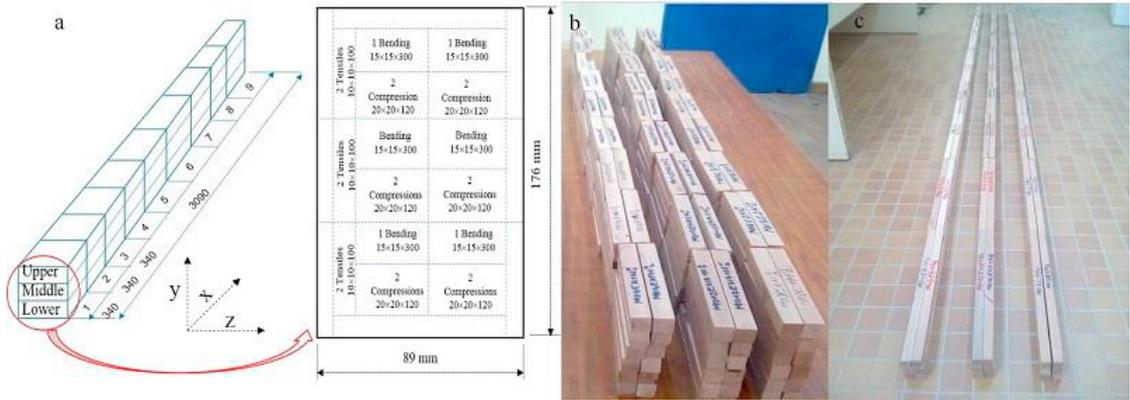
Spatial representation of the beam. a) Beam cutting plane. b) Compression specimens. c) Bending specimens
